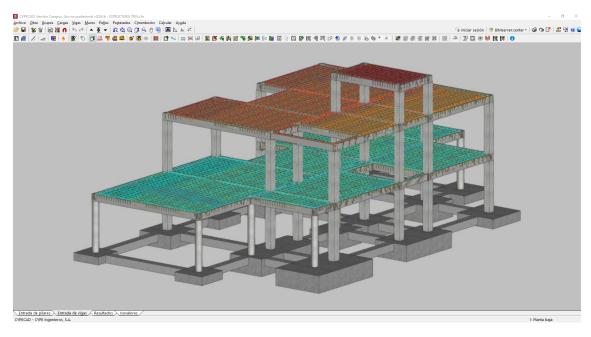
Reinforced concrete structure of the single-family house in CypeCAD
